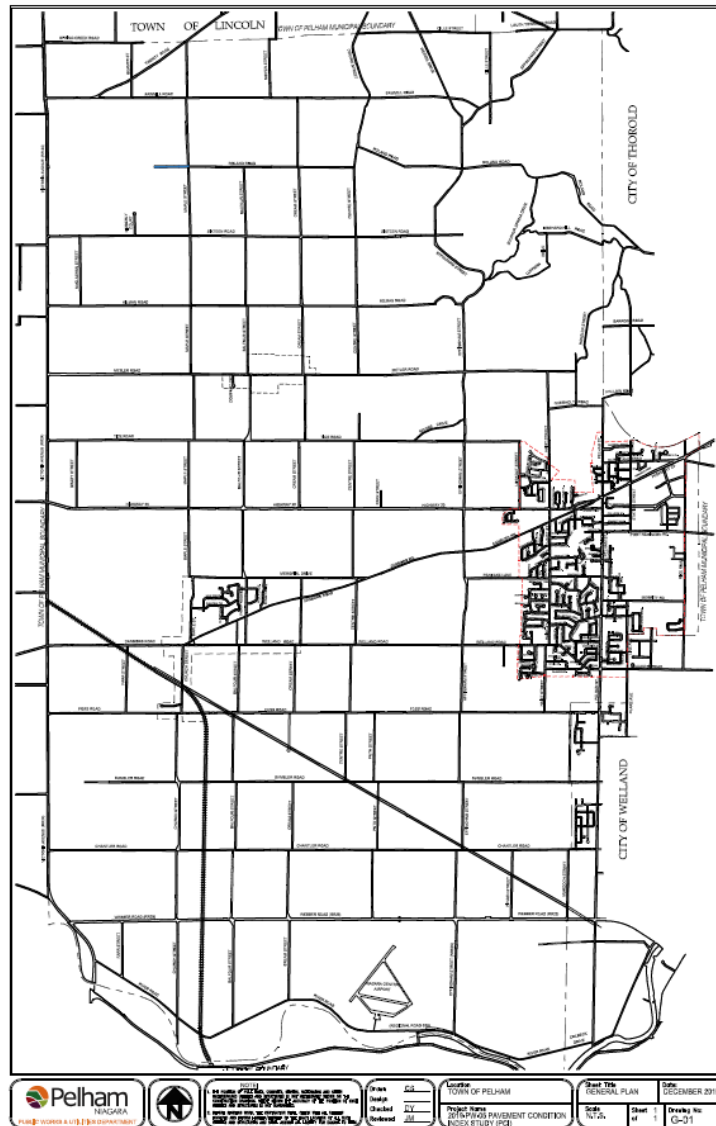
Road Sections Included in the 2023 Pavement Condition Evaluation
